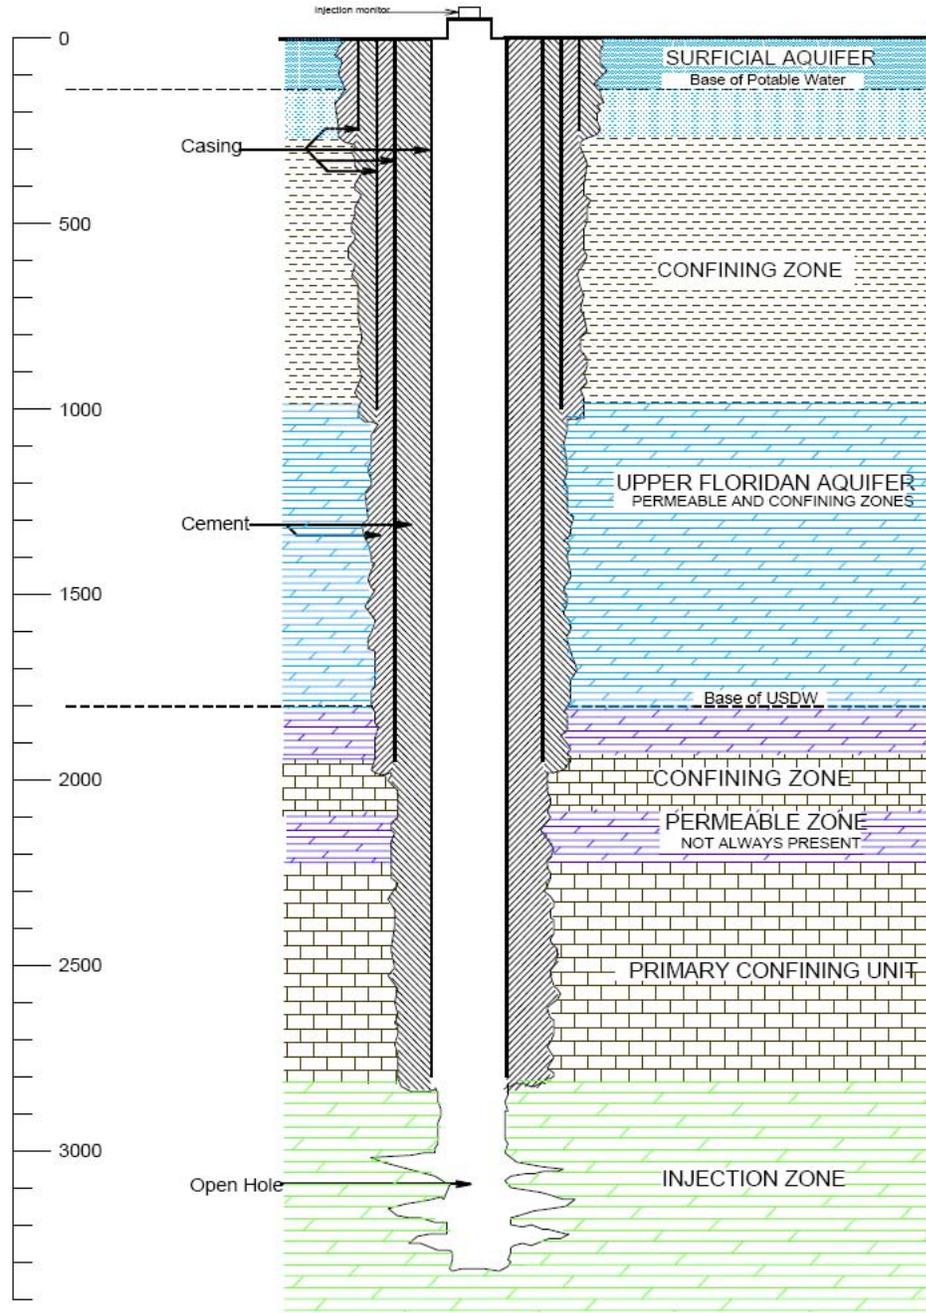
Typical Class I Well Construction in Southeast Florida (USEPA, 2007)
